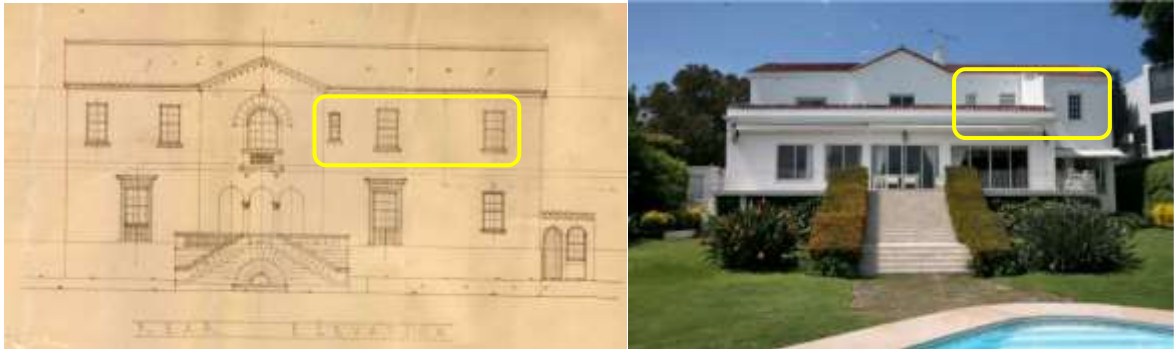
(L) The rear elevation of the 1928 Gilling scheme (Source: WMC Files) and (R) in 2014. (Source: Demolition Report, 2014)
